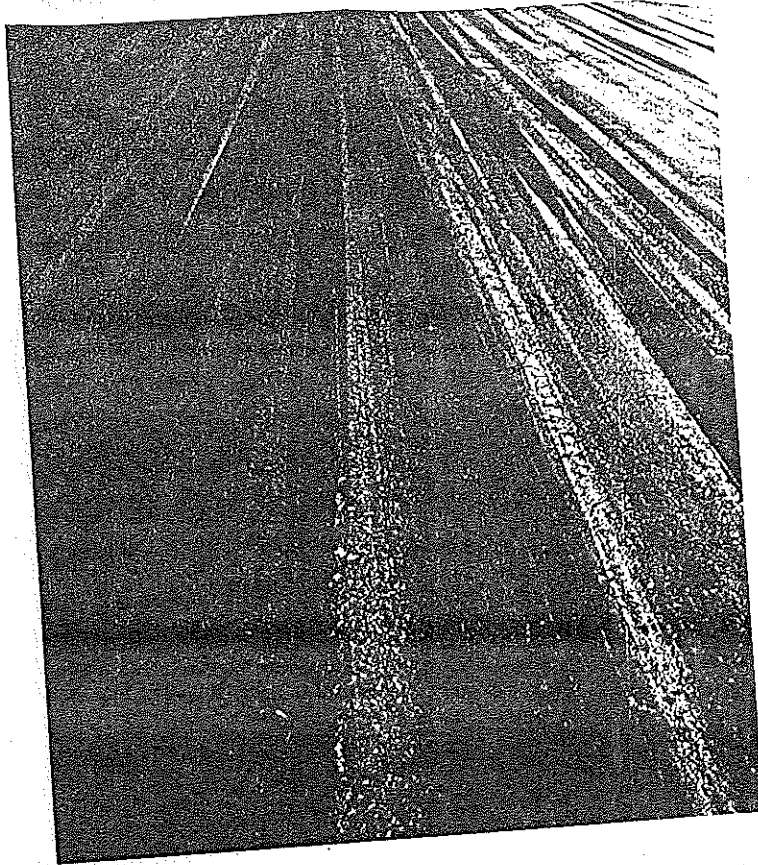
2 : Longitudinal Cracks in the Pavement
